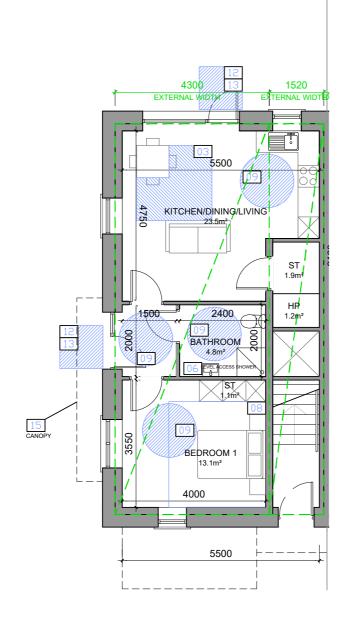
Duplex Type B Ground Floor Plan (4 no. units) Scale 1:100
